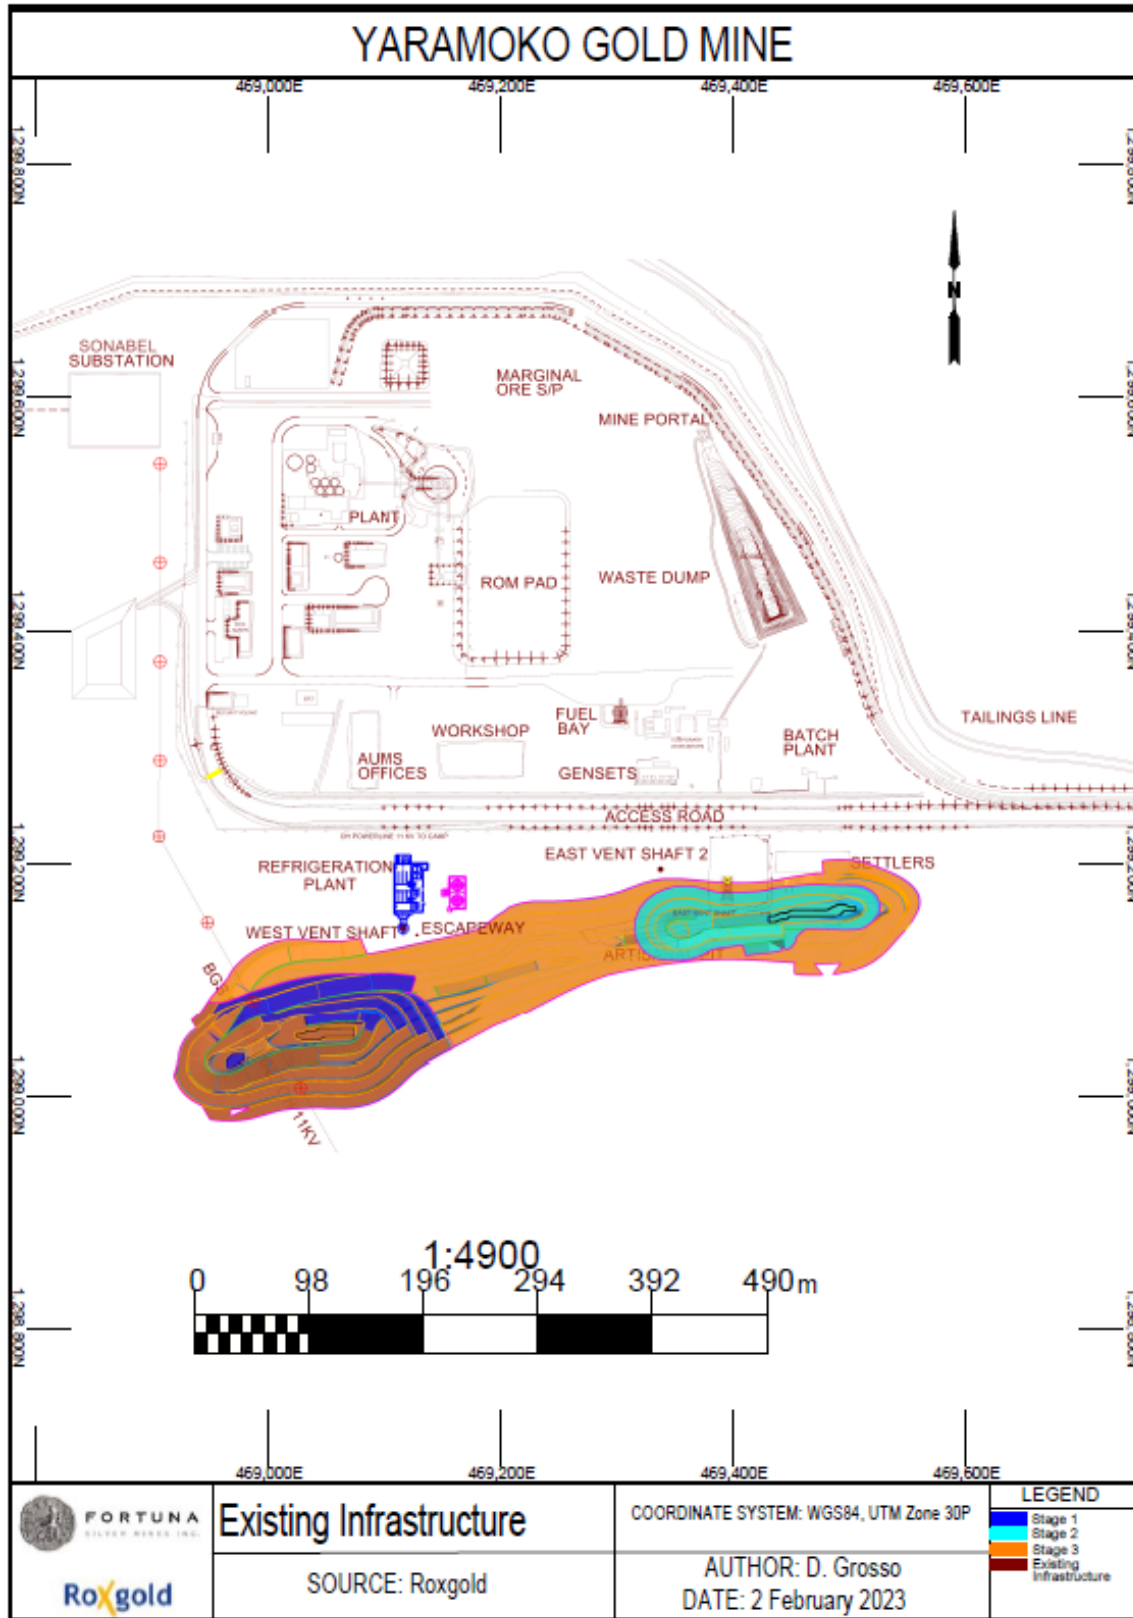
55 Zone pit stage designs shown against existing site infrastructure
